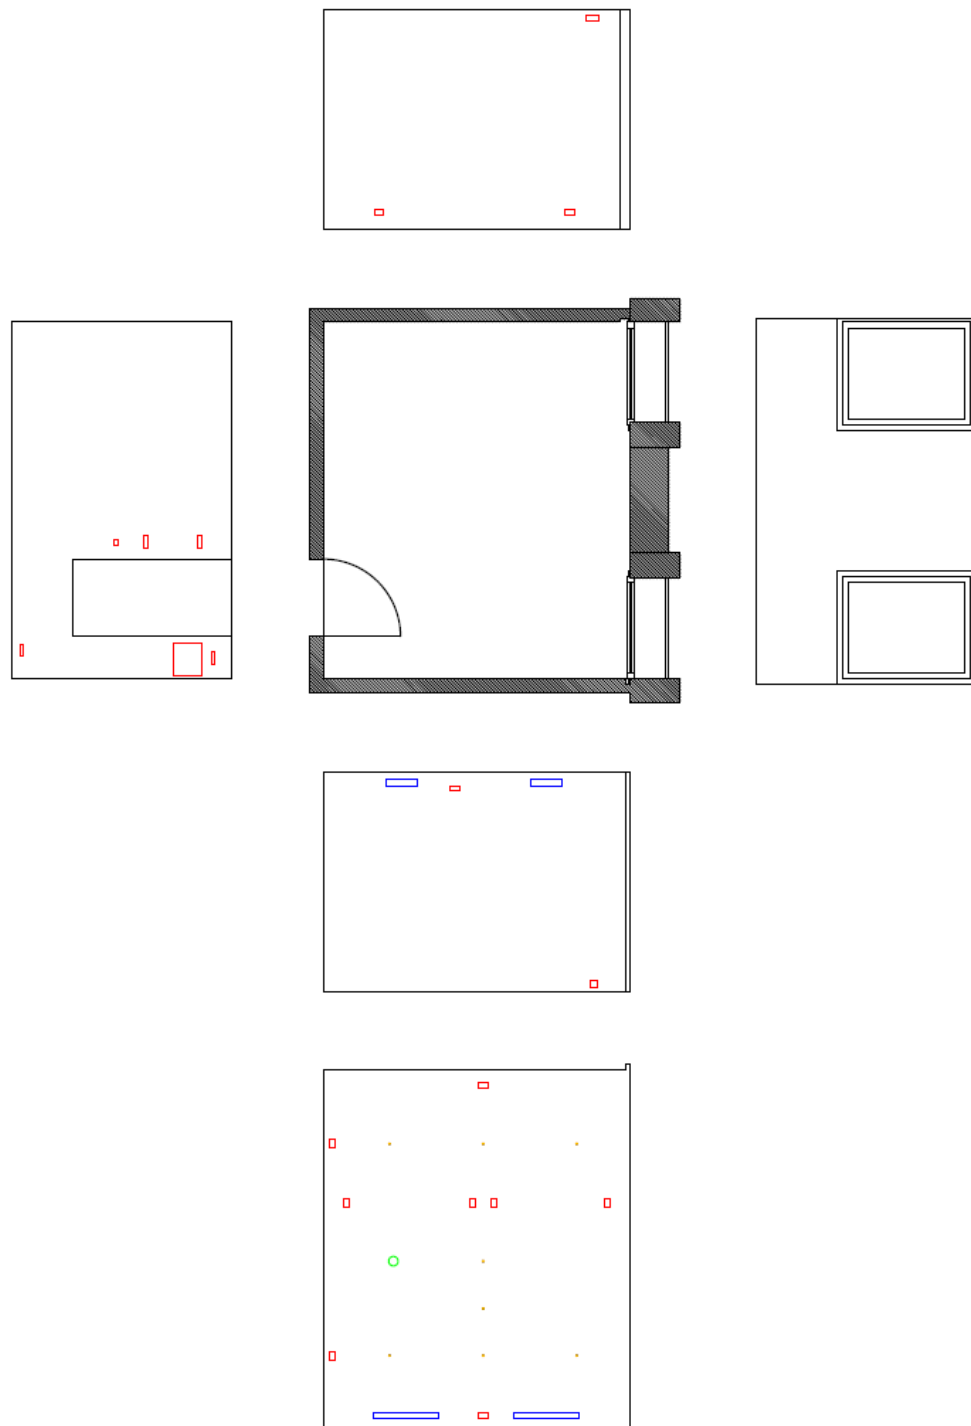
Exploded view drawing of the test room (Red: Electrical boxes; Blue: Supply/Extraction grille; Yellow: Lighting supports; Green: Fire protection device)
